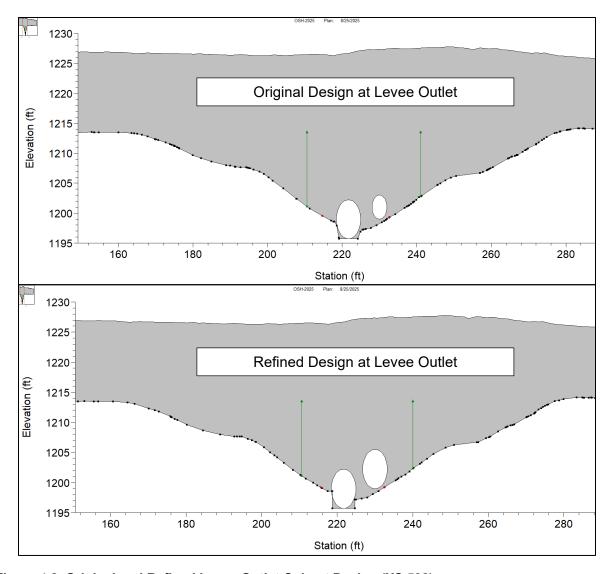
Original and Refined Levee Outlet Culvert Design (XS 508)
